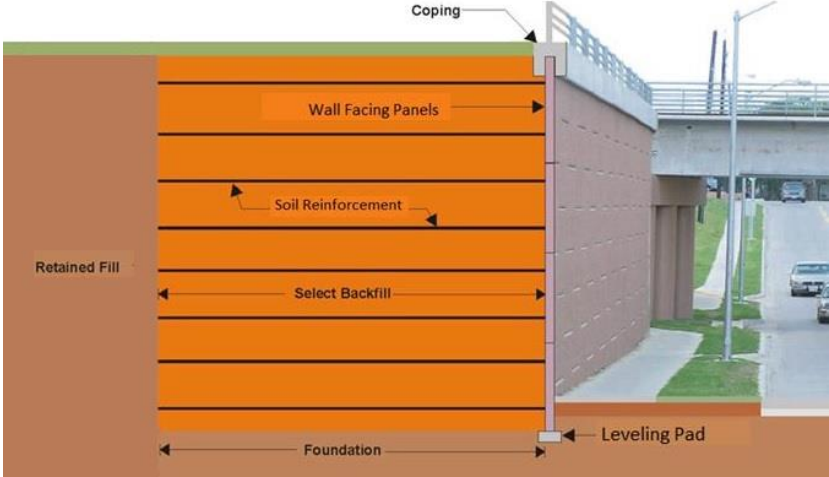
Reinforced soil retaining wall elements (Passe, 2000)
